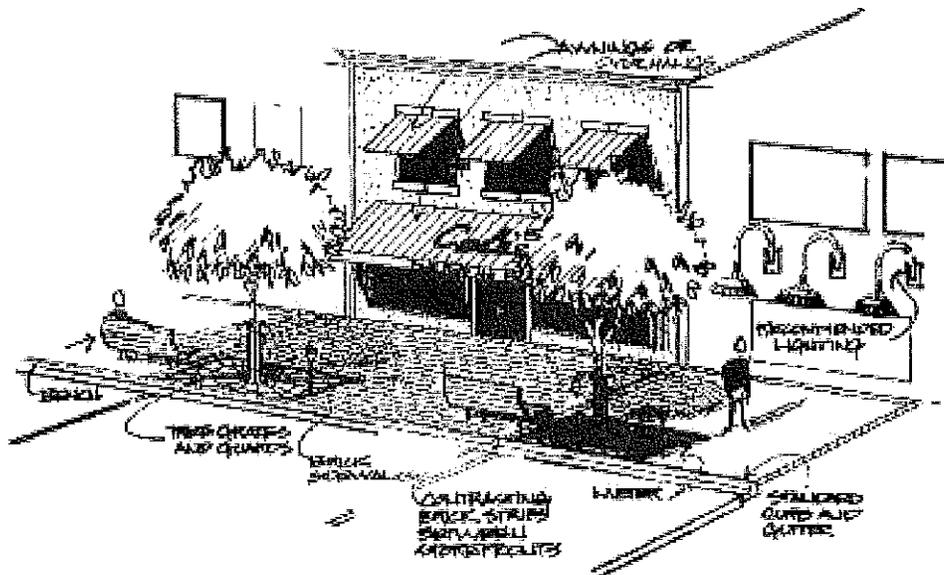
STREETSCAPE FOR A TYPICAL STOREFRONT
